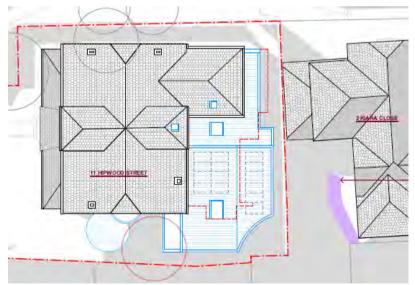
Original Proposed Overshadowing (21 June 12pm)
